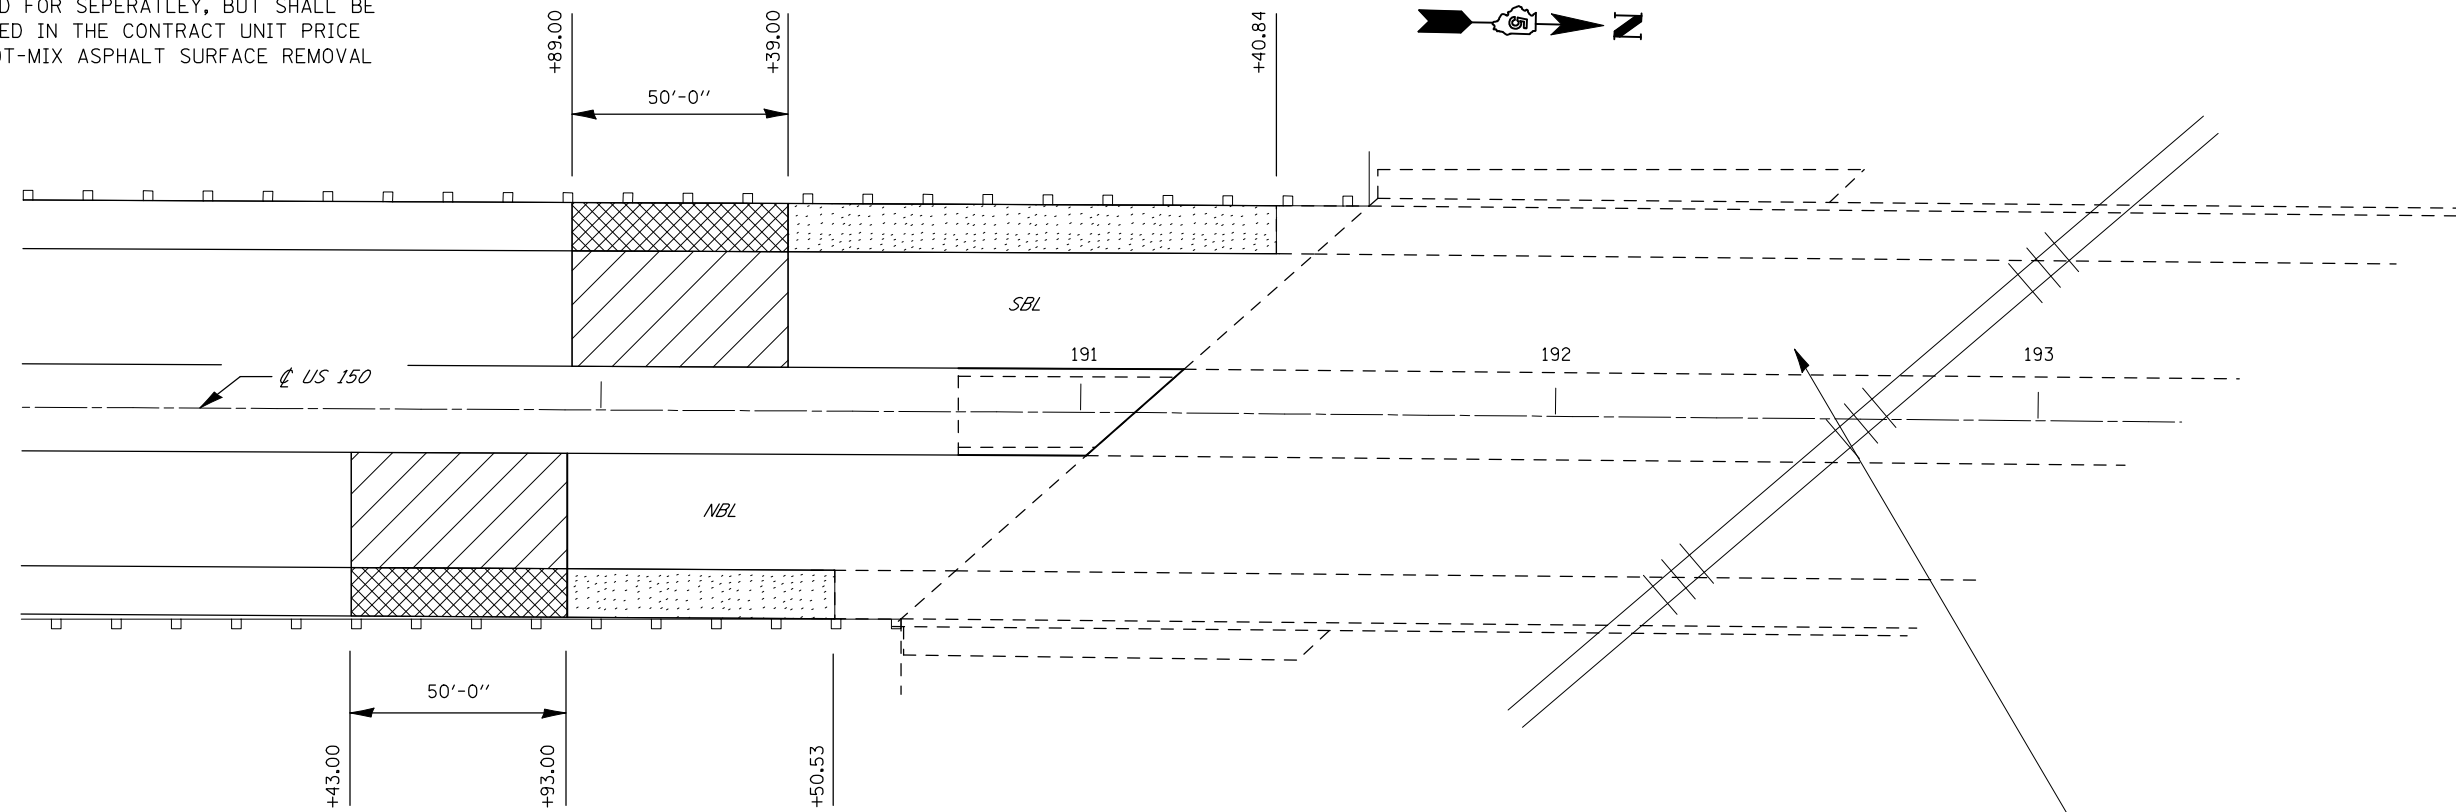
DETAILS FOR P.C.C. BUTT-JOINTS AT S.N. 057-0202
